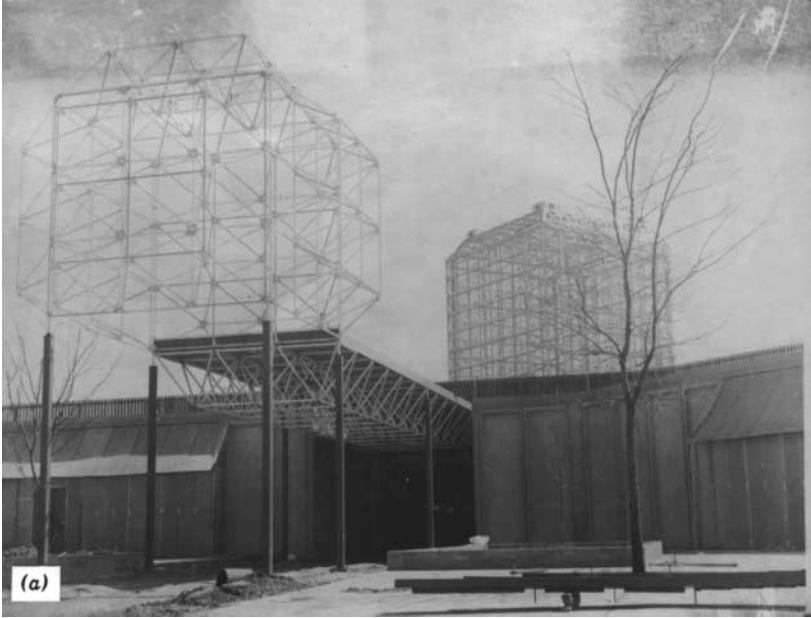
Cold-formed steel sections used in space frames (*Unistrut Corporation.*)
